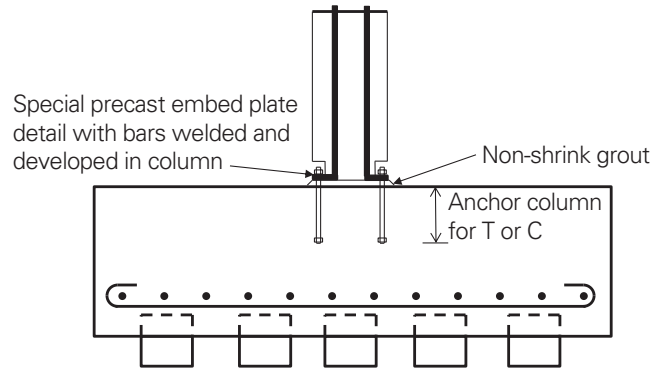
Typical precast concrete column-to-pile cap connection detail.
